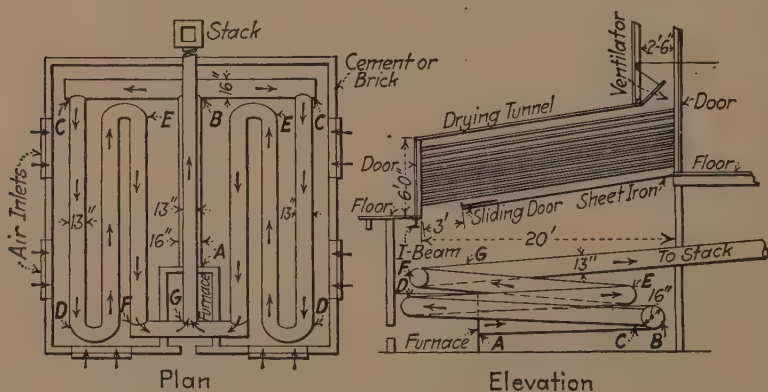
Sketch of Oregon tunnel dryer showing arrangement of heating pipes. (After Lewis).
